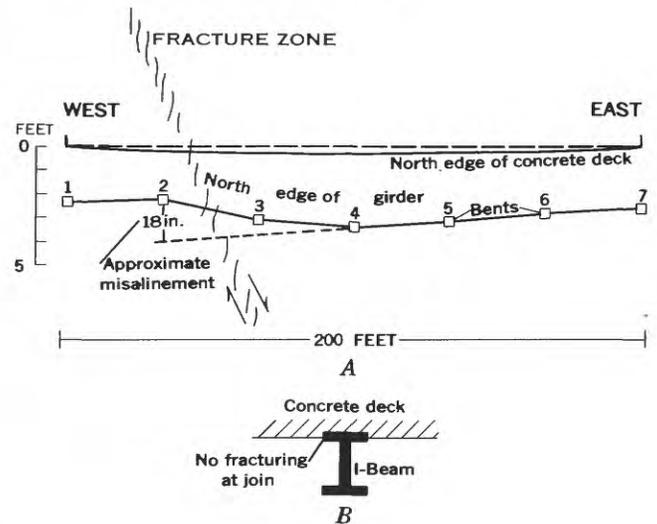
Diagrammatic plan showing misalignment of I-beam girder at Parkfield bridge (A) and cross section (B) of I-beam showing no fracturing at joint between deck and beam.
